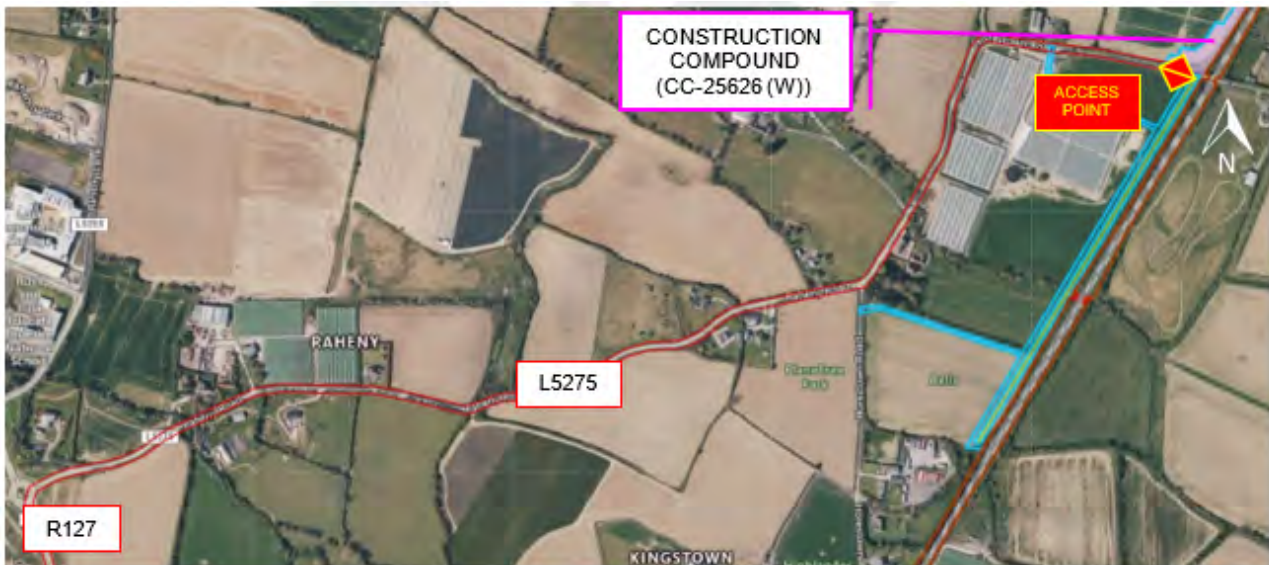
Proposed access to OBB44 track lowering works Construction Compound
